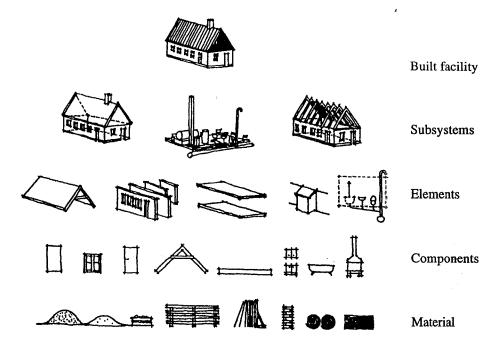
Level structure of built facilities. Things belonging to the levels: built facility, the principal subsystems, building elements, building components and building material.
